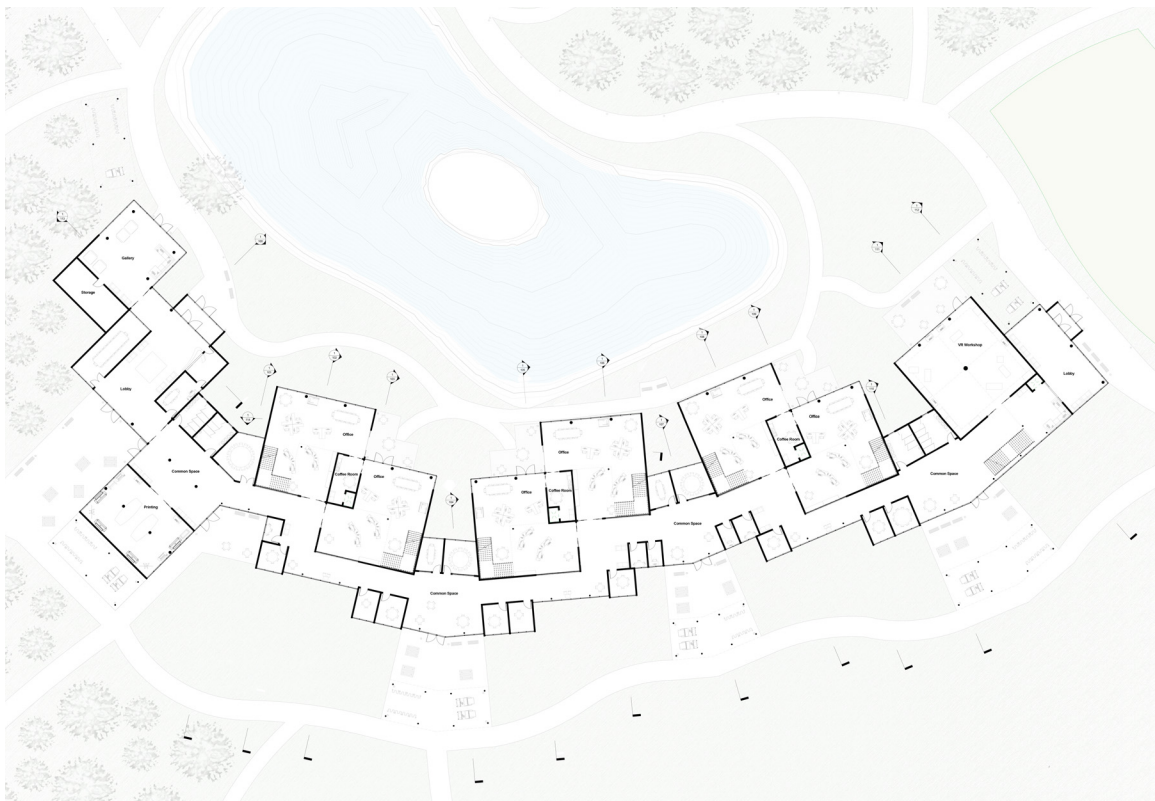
Plan of Design Center, illustrating pockets of negative space used for view corridors
